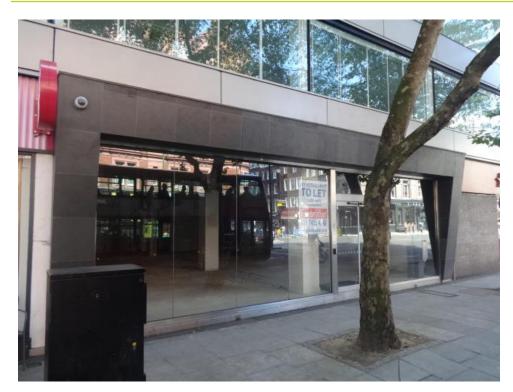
Front view of unit 133 Clerkenwell Road – application site. Slate surround to be retained.
